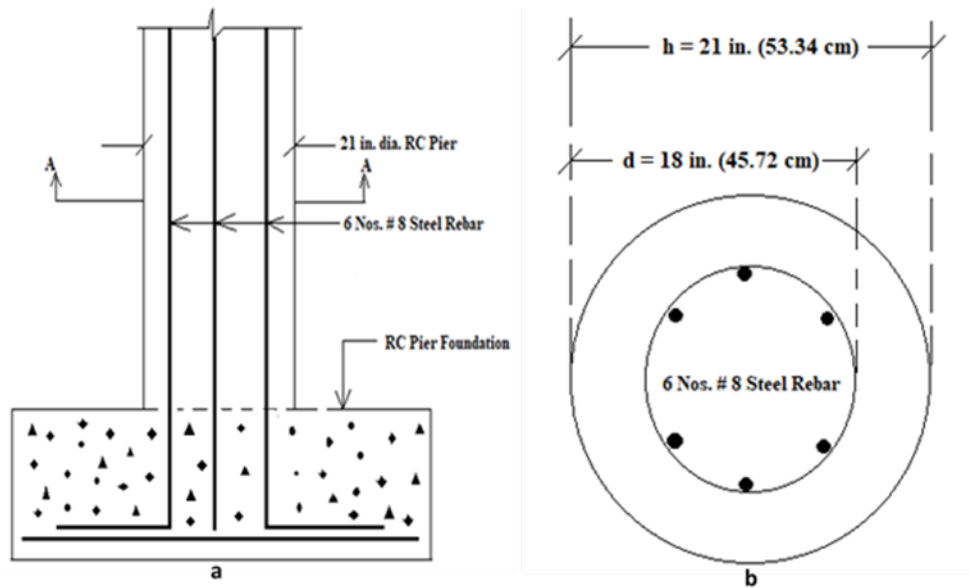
(a) Representative RC Bridge Pier, (b) Section A-A
